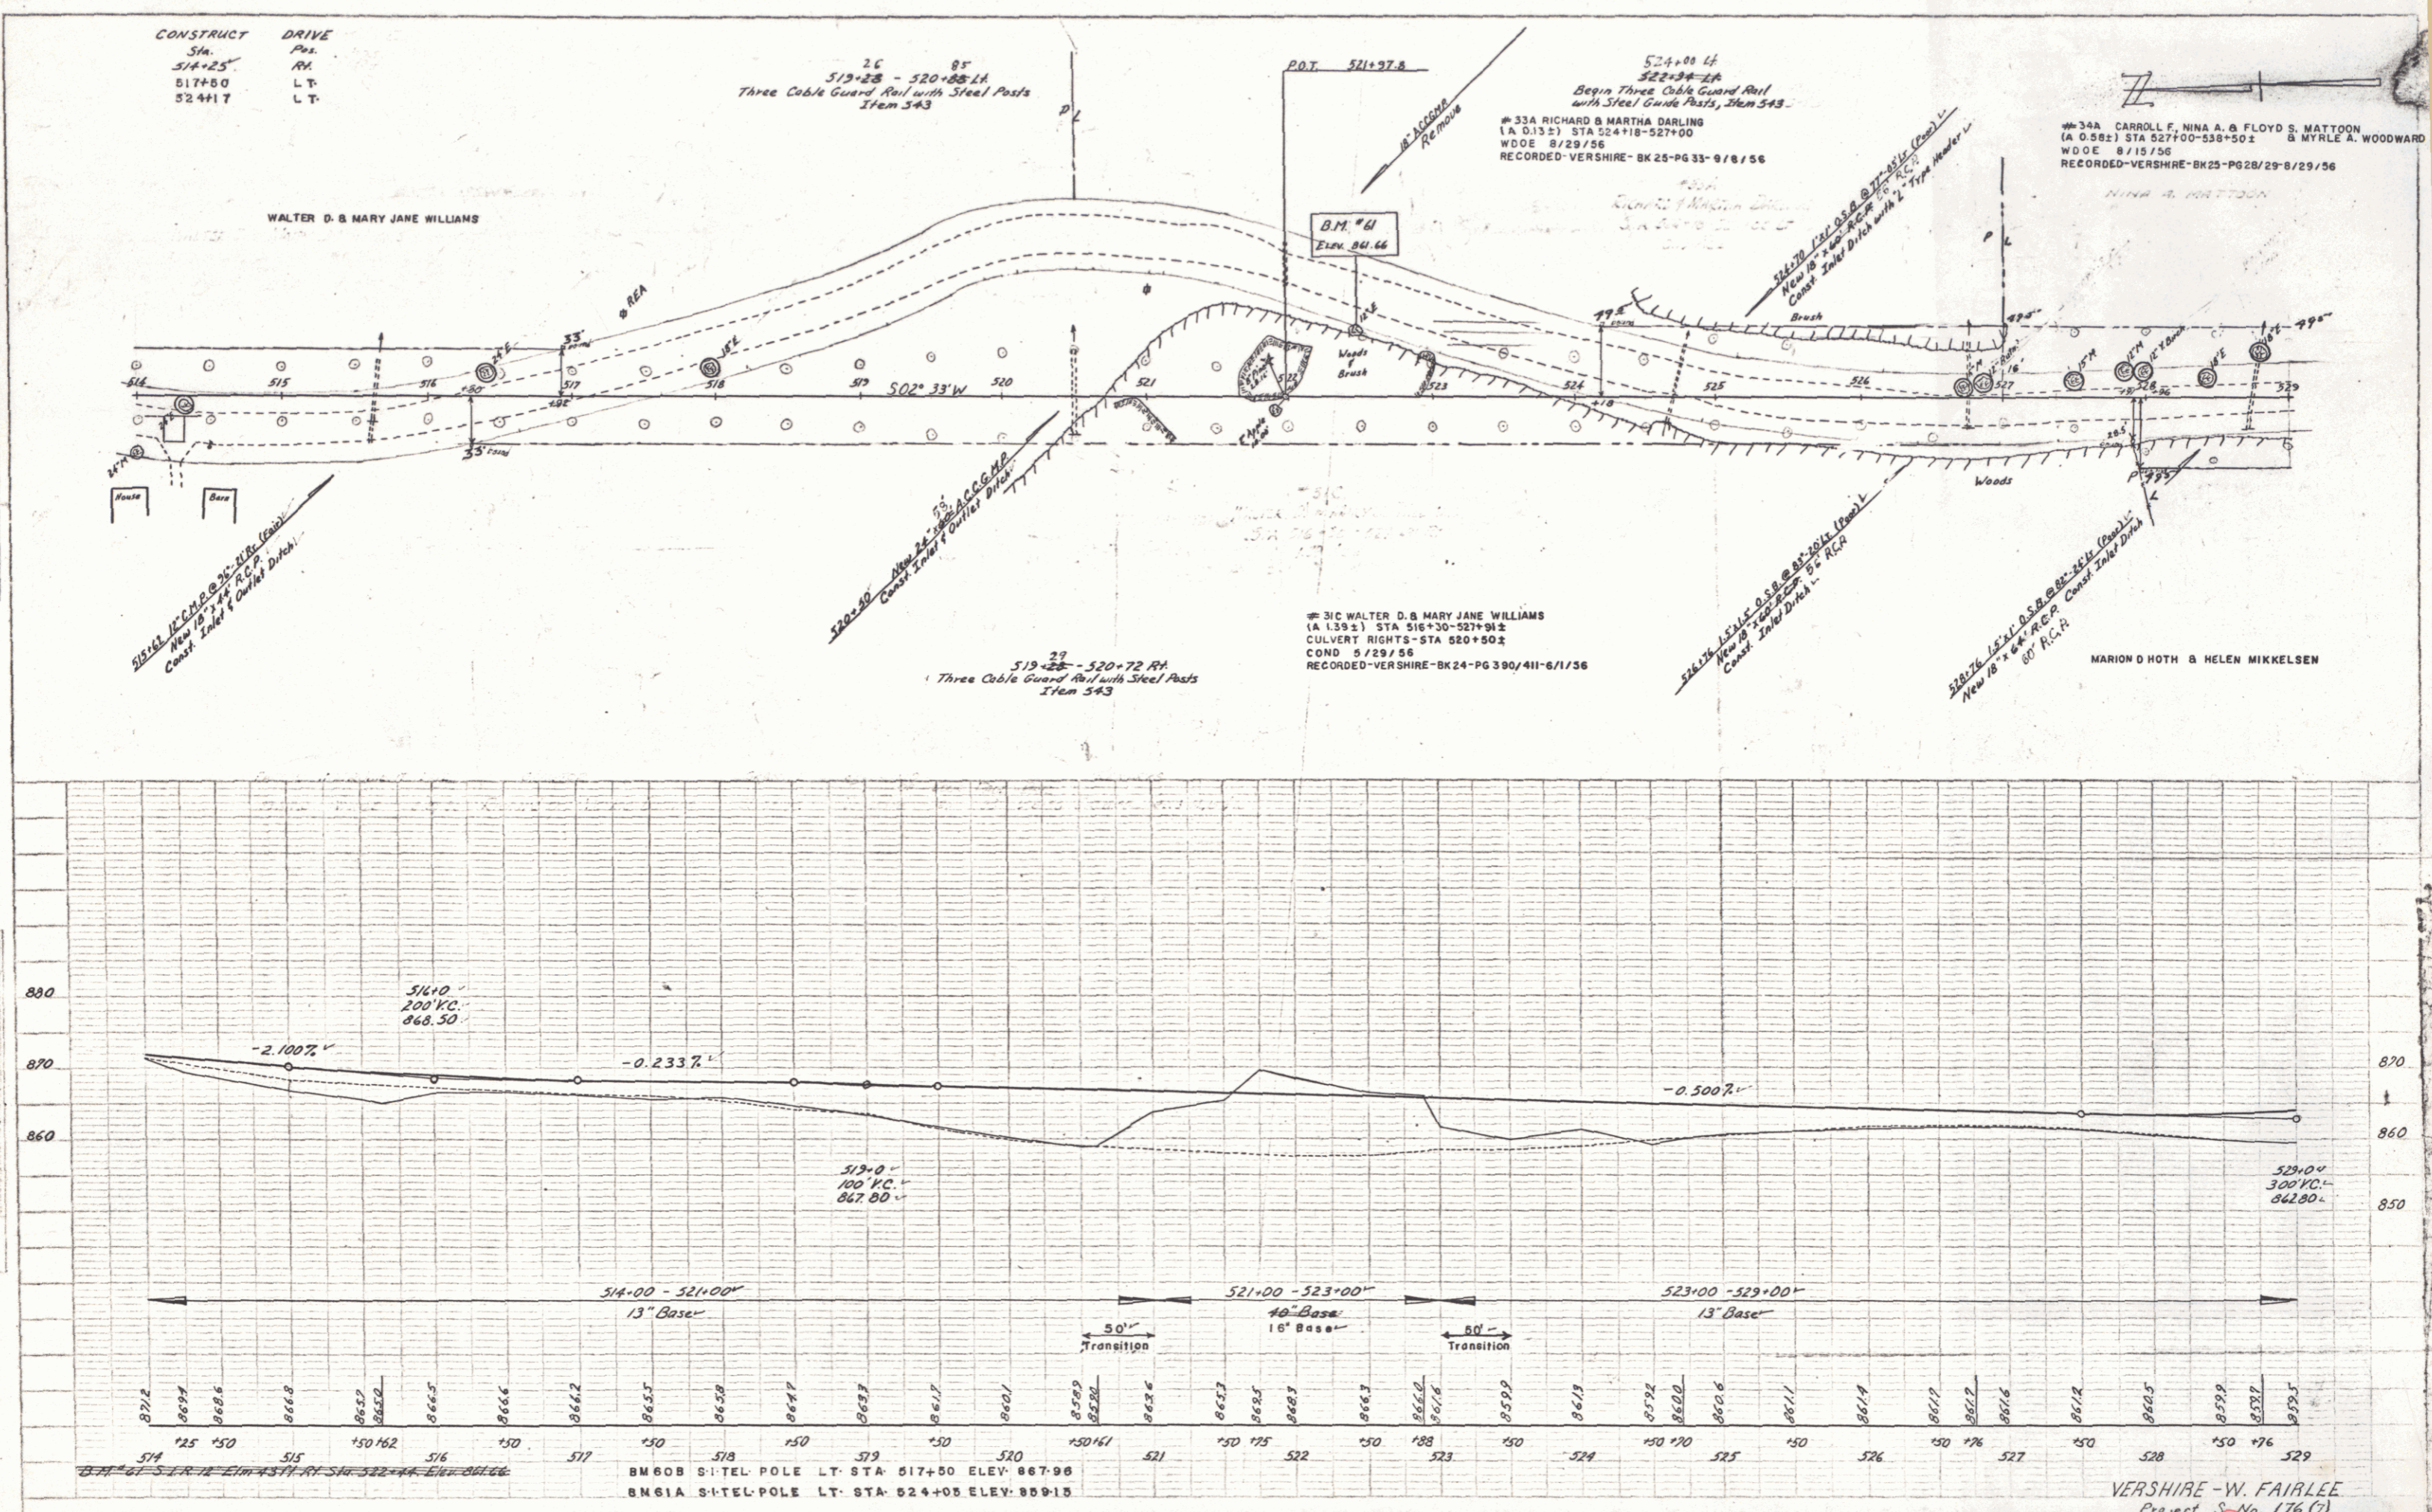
PLAN PROFILE & P.A.A.S. DRAWING
